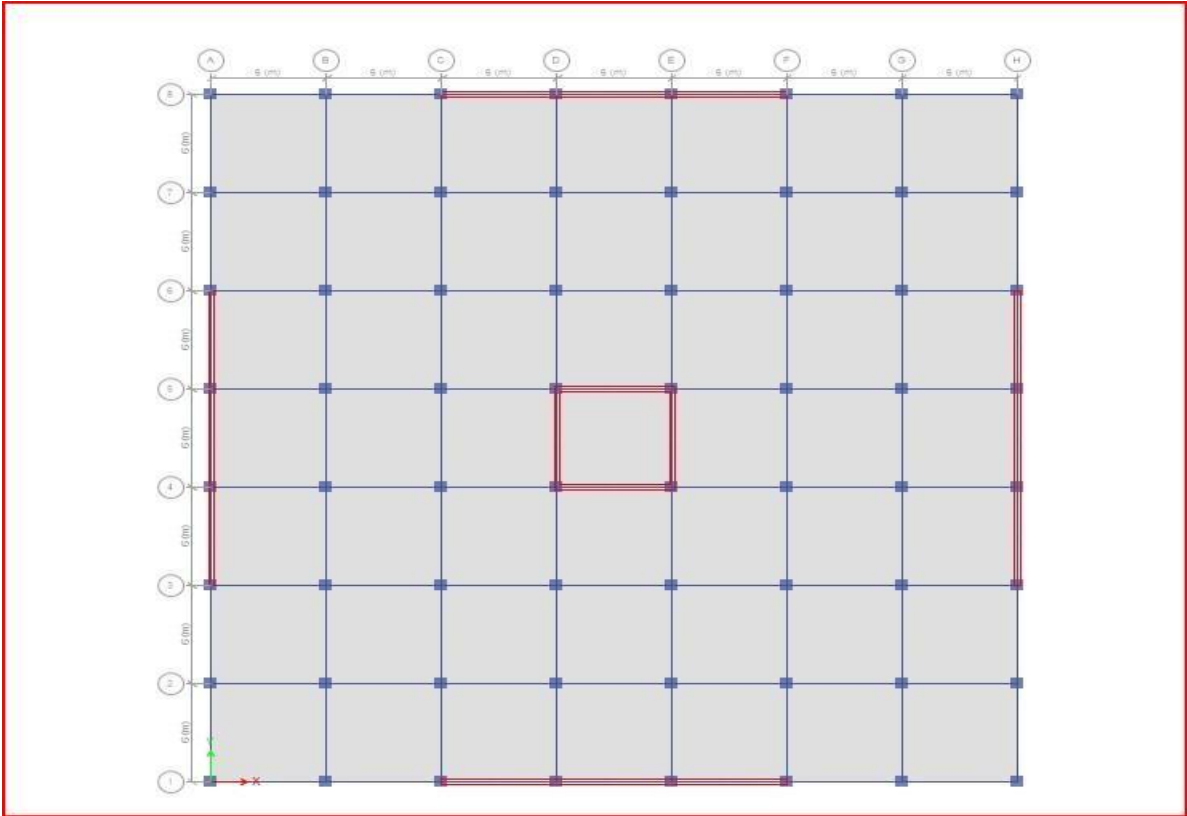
plan view of Soft Story model with diagonal stiffeners
